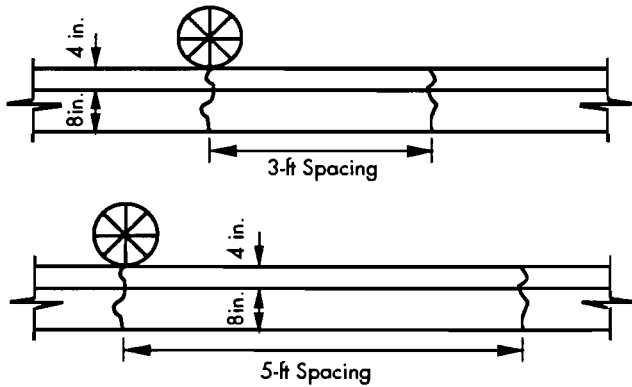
Wheel load position above crack for typical crack spacings in BCO
